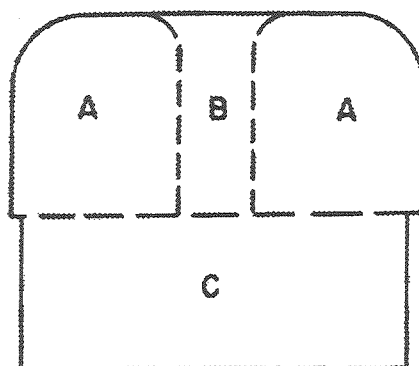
Tunnel excavation sequence. (See text for explanation.)
